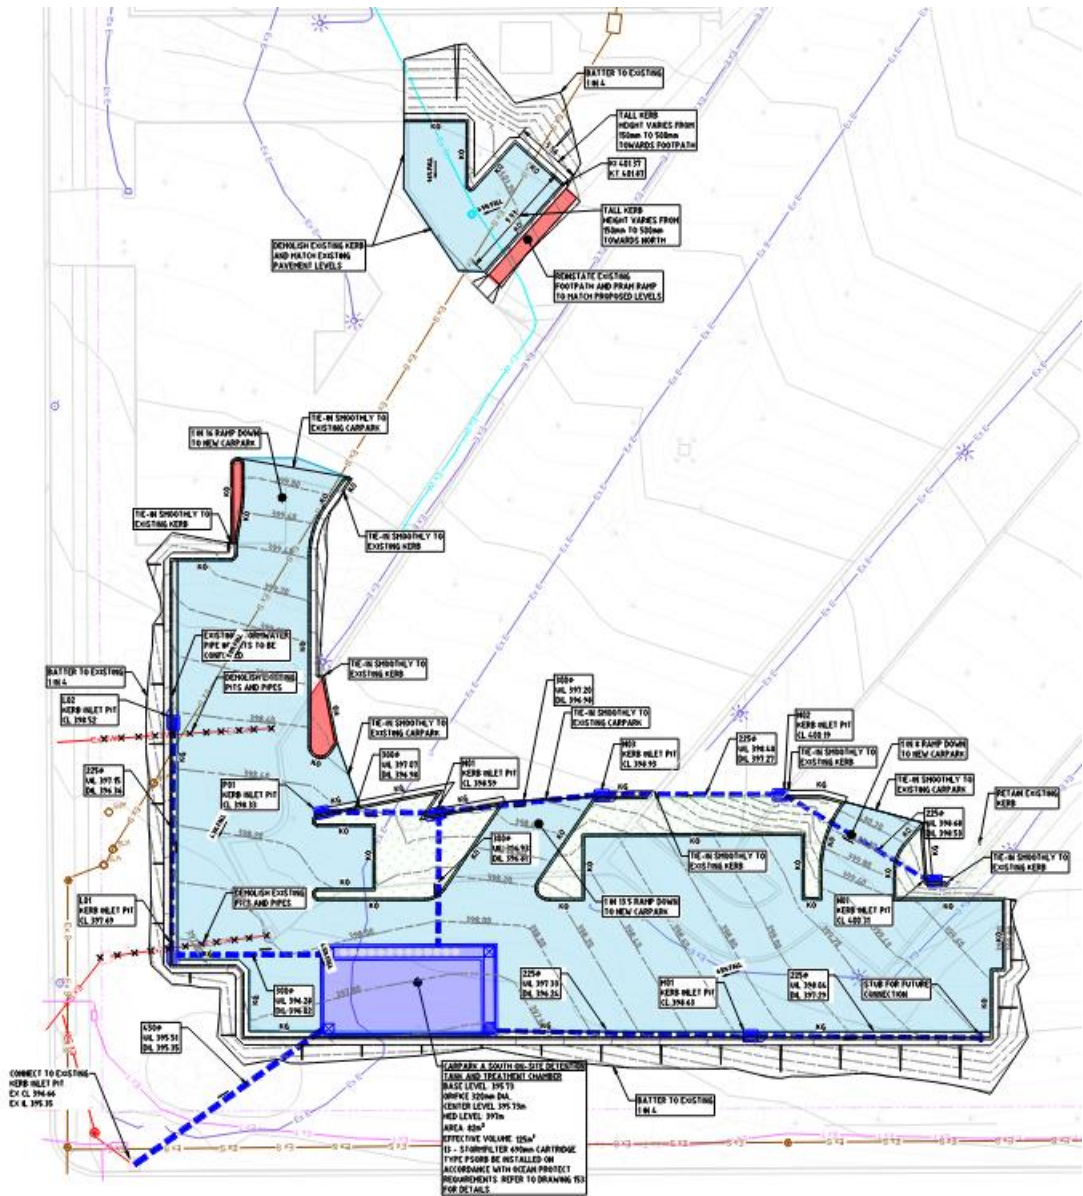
Northwest Carpark Zone 2 Stormwater Drainage.
